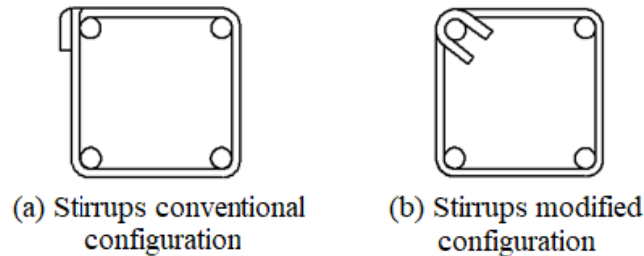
High strength concrete column stirrups conventional configuration (a) and modified configuration (b) (Kodur et al., 2005).
